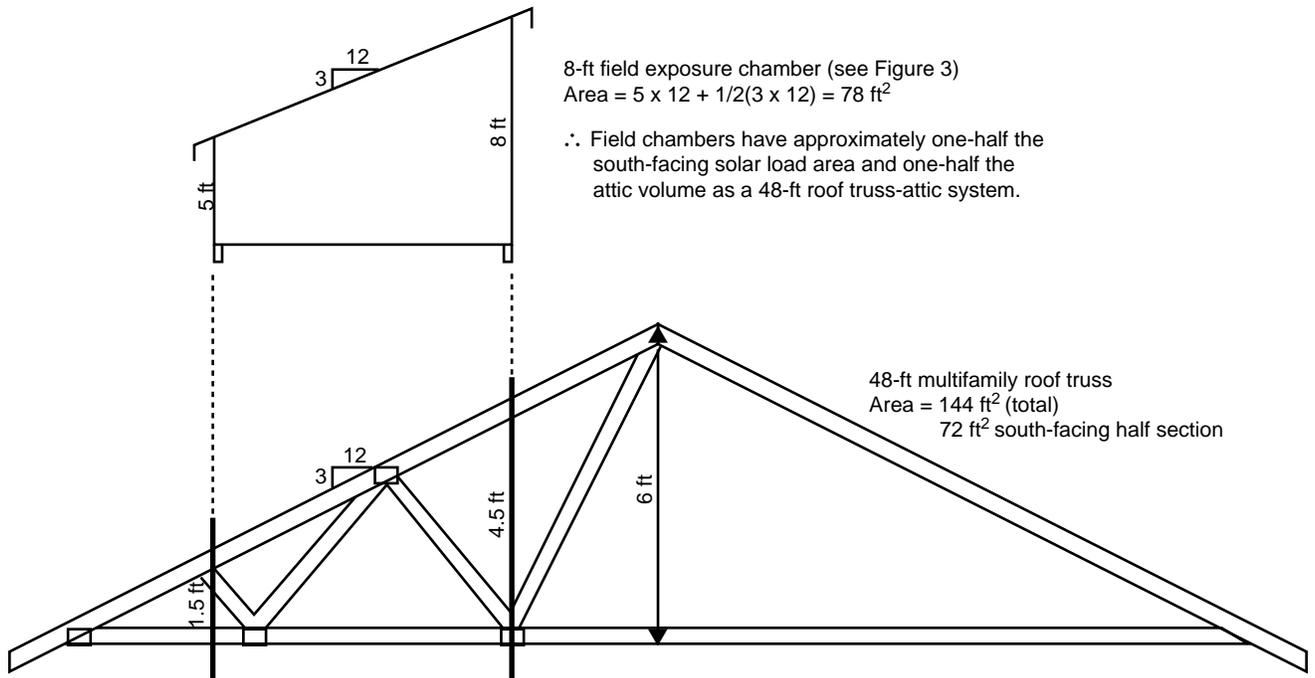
View of field exposure chamber in relation to roof truss of multifamily structure. Field chamber has approximately half the south-facing solar load area and half the attic volume as that of a 48-ft (14.6-m) roof truss–attic system. $1 \text{ ft}^2 = 0.09 \text{ m}^2$.
